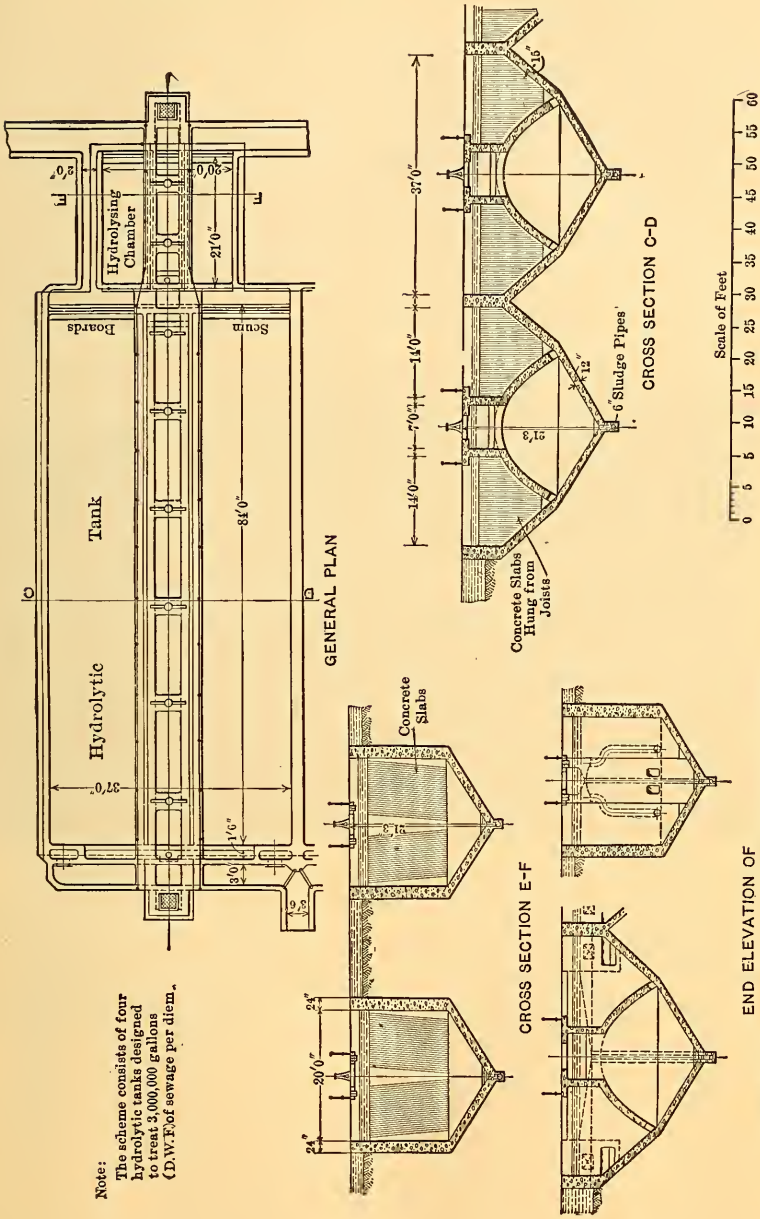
Plan and Section of Hydrolytic Tank and Hydrolysing Chamber at Norwich (Collins, 1908).
